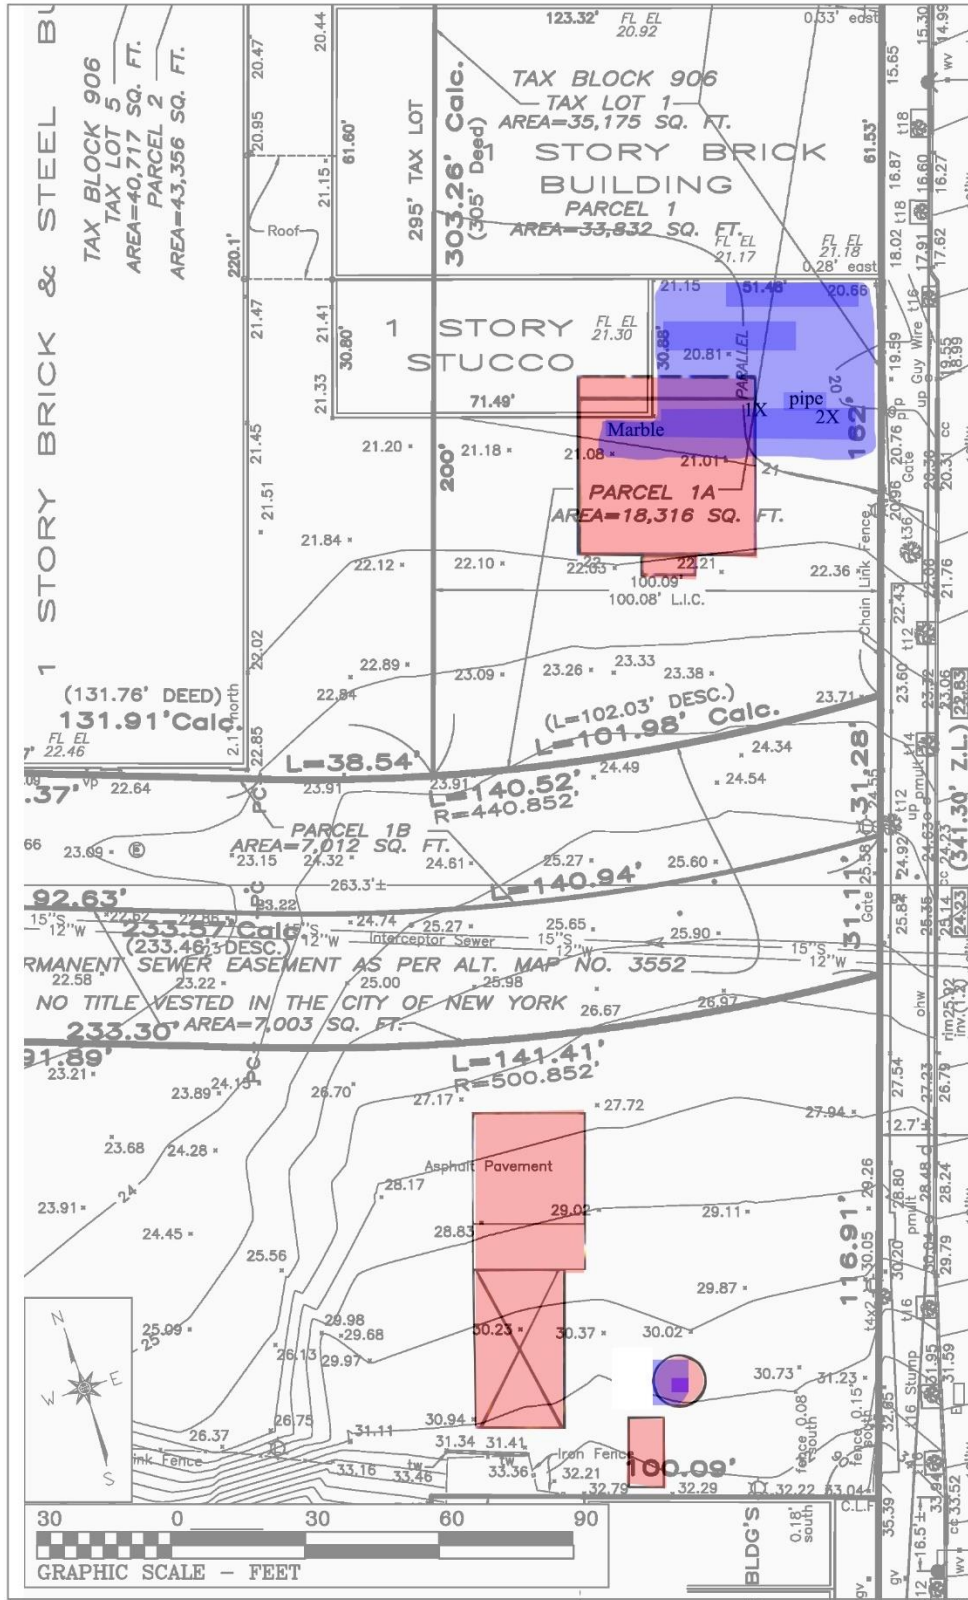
AREAS B and C – MP detail showing the location of the former buildings ■ and the excavation trenches ■.
